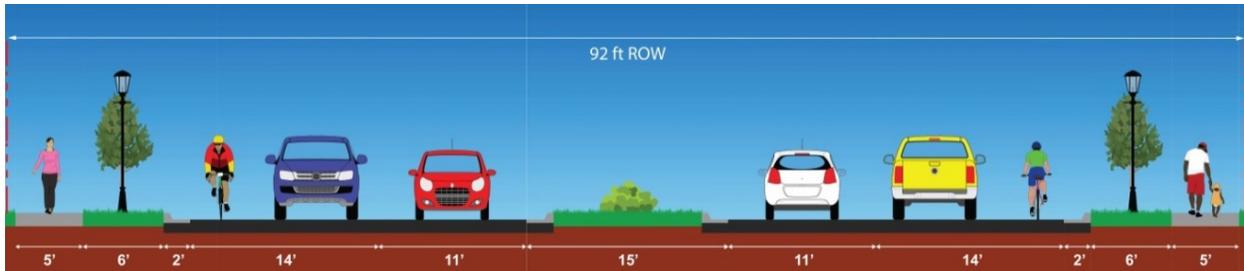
Recommended Rural Neighborhood Typical Section (Southern Segment)
